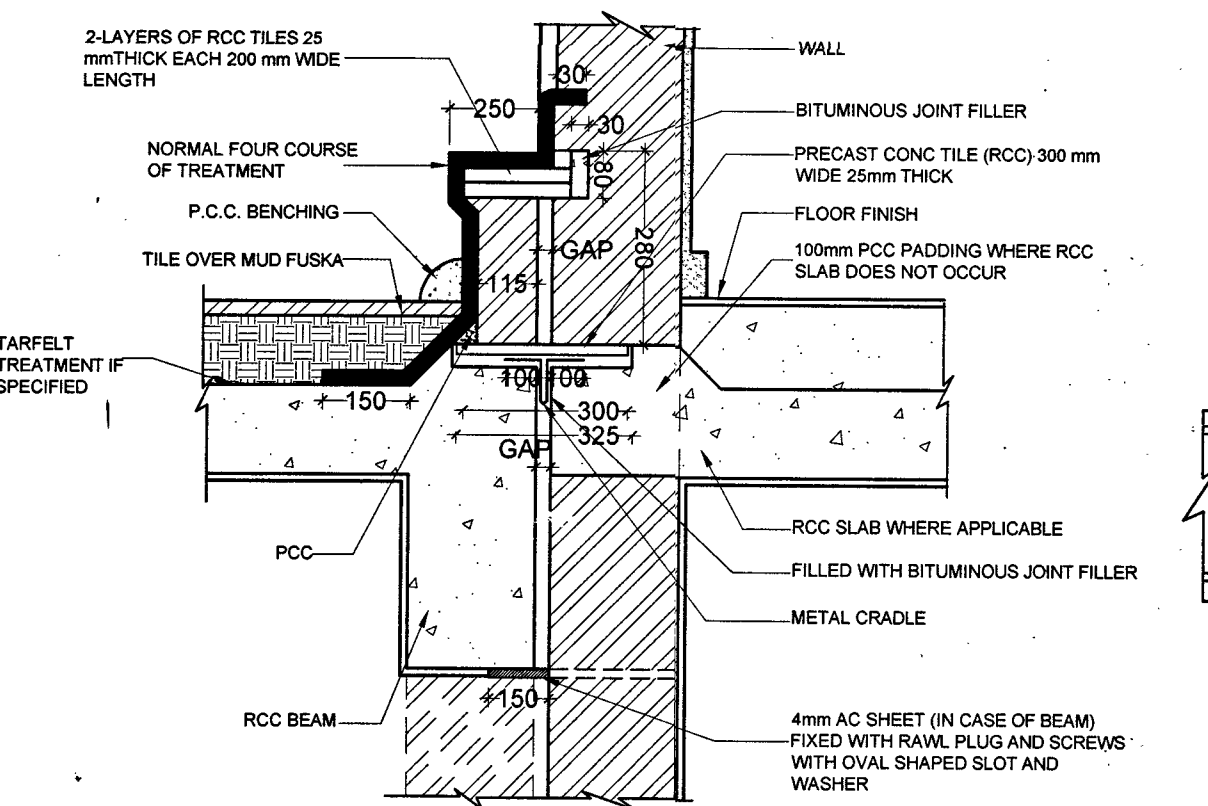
DETAIL OF SEPARATION JOINT AT ROOF BY THE SIDE OF WALL
